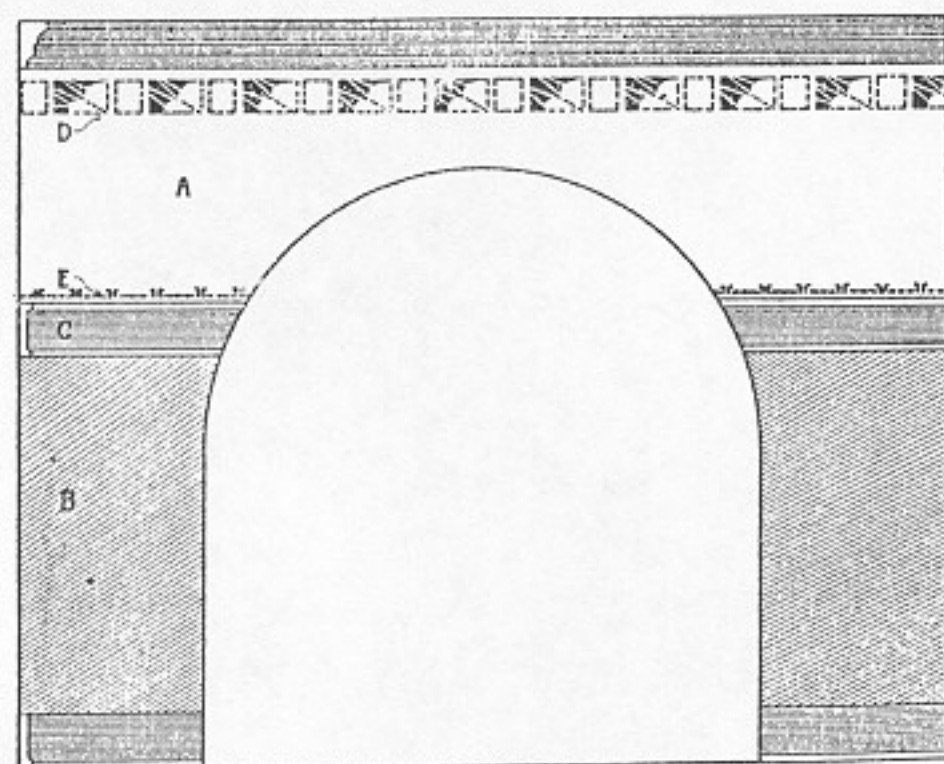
Stencils Used in Decorating Rear Wall and Ceiling of Studio.
